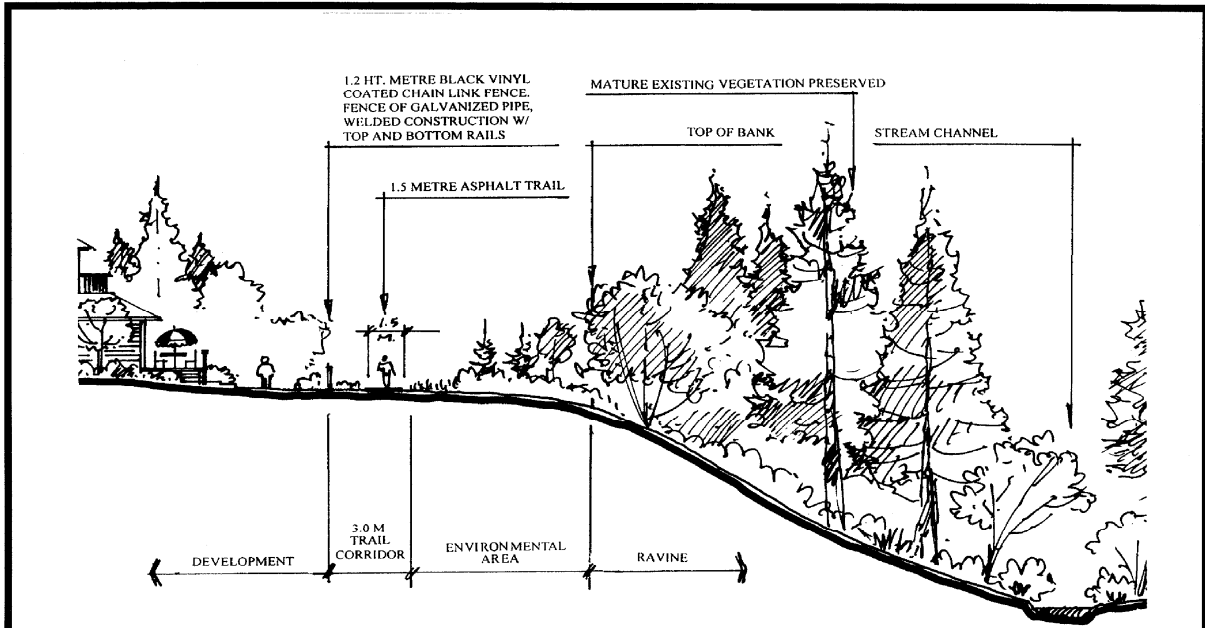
CROSS SECTION - TYPICAL RAVINE TRAIL
